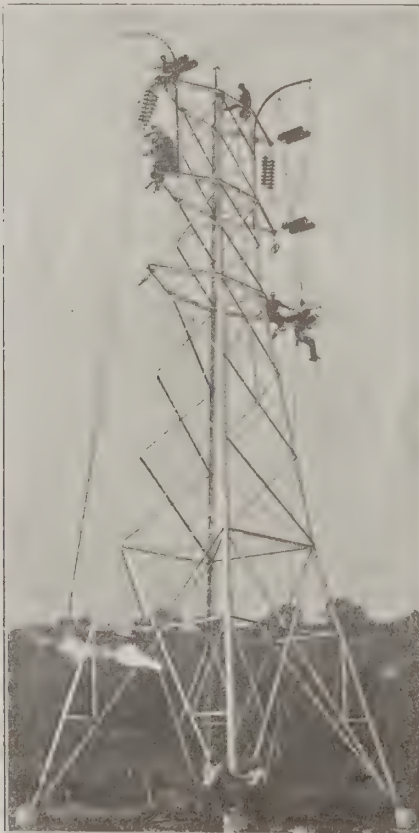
AN ANCHOR TOWER ON ST. LOUIS LINE.
